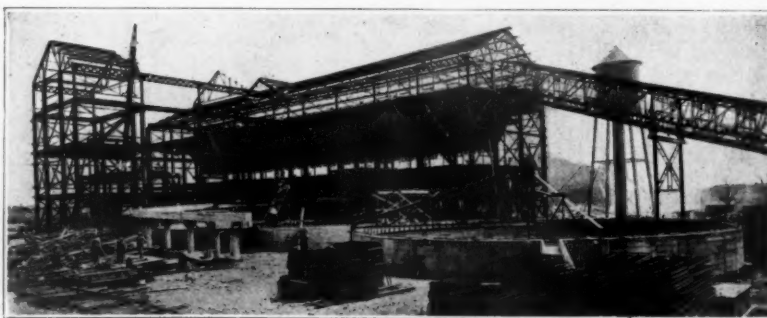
Construction view showing, in the foreground, two 70 ft. diameter concrete Dorr Thickeners in connection with the Sludge Recovery System. In the background, left to right, Drier Building, Main Washery Building and 75,000-gal. Water Tower
